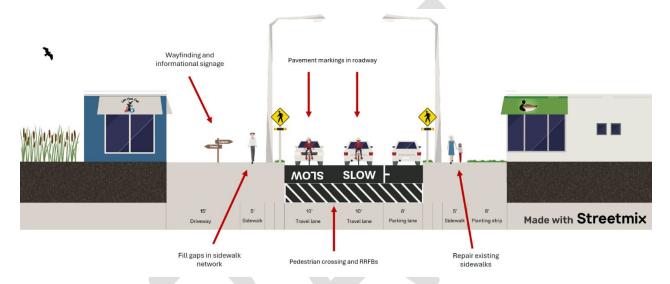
A design for Main Street depicting sidewalk improvements, a pedestrian crossing with RRFBs, pavement markings, and signage. Created using Streetmix.
